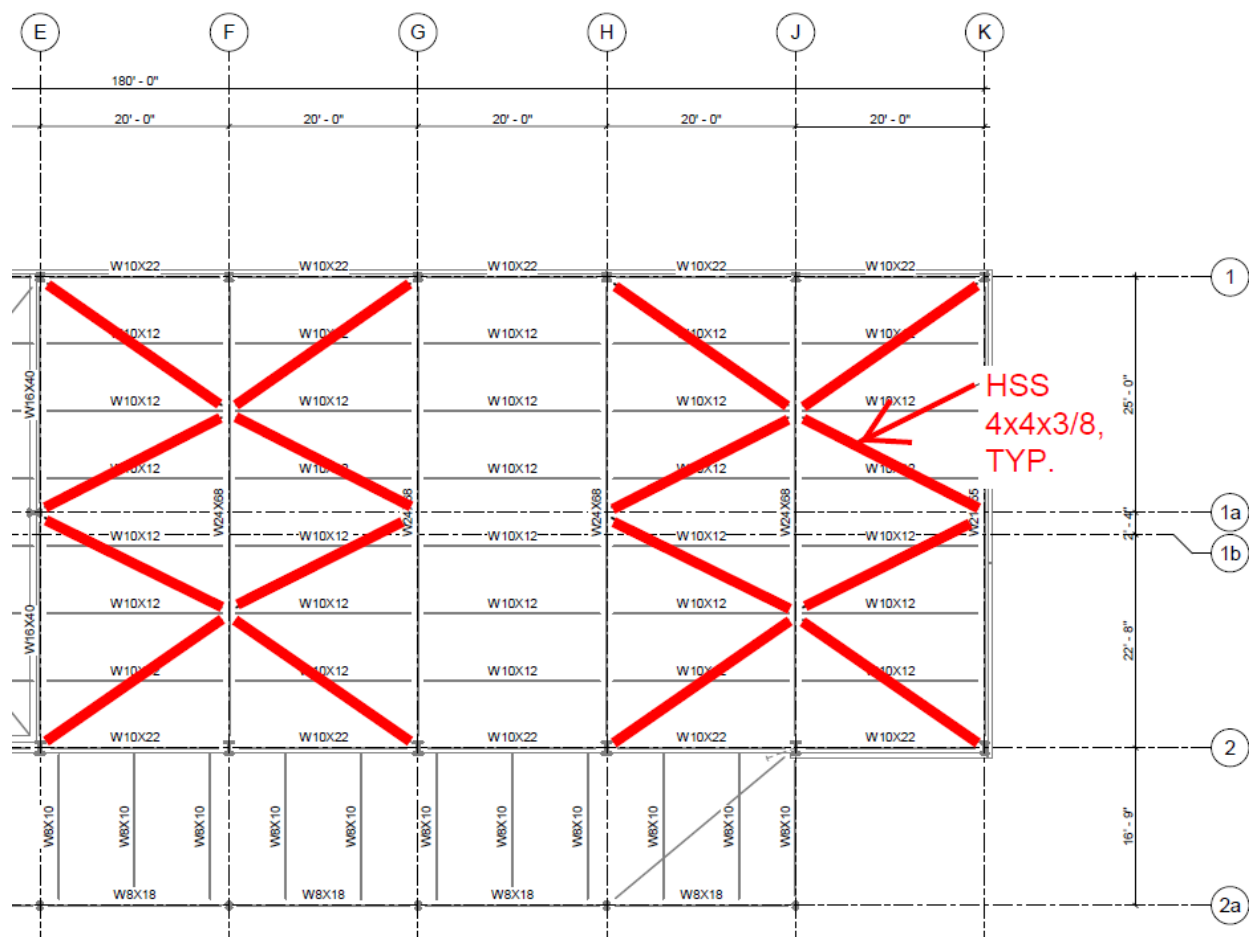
Partial High Roof Framing Plan - Horizontal Bracing
